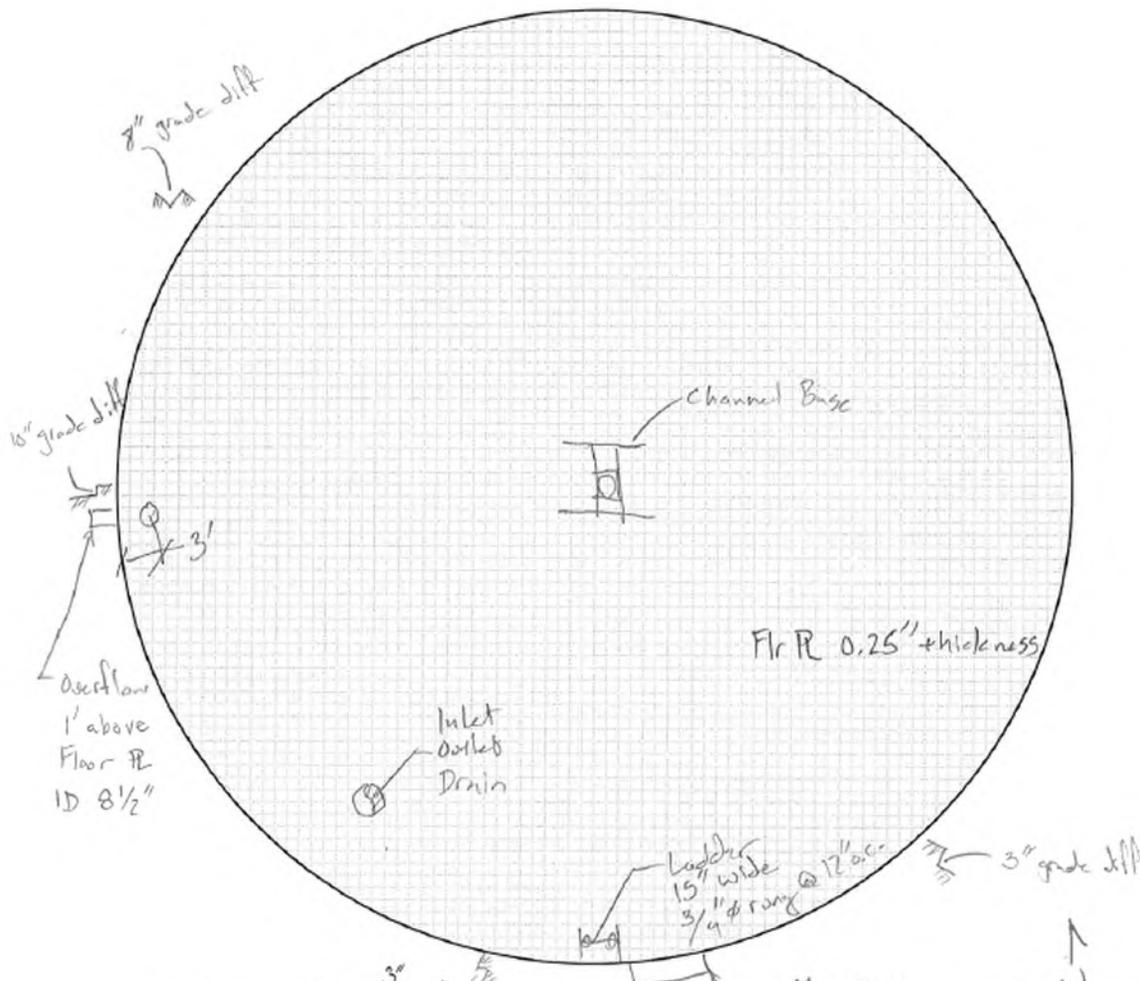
Reservoir FLOOR Plan –Note location of Footing, Drain Pipes, Manways, etc. List given and measured diameter.
